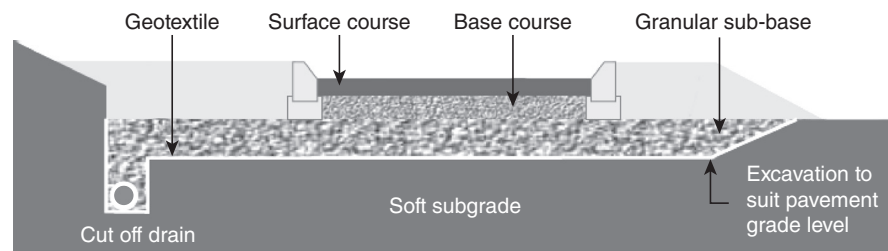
Complete layout of geotextile for pavement. (Courtesy: Terram Geotextiles)
